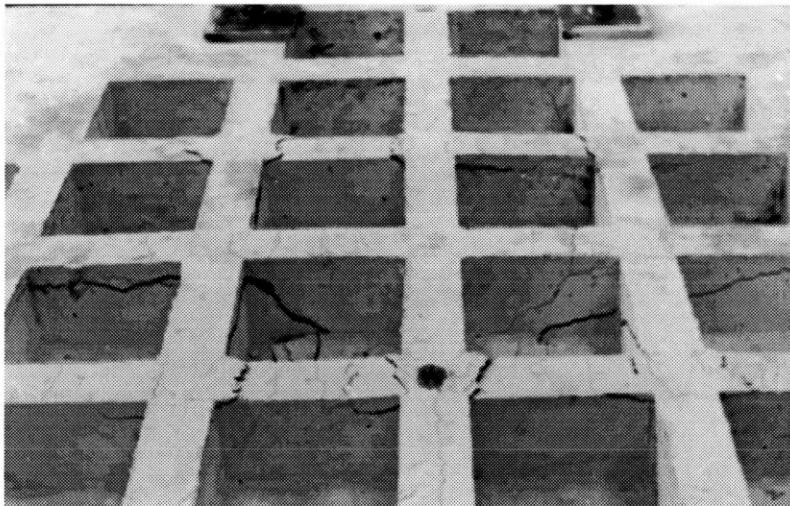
(b) Crack pattern after punching failure — slab No.2
